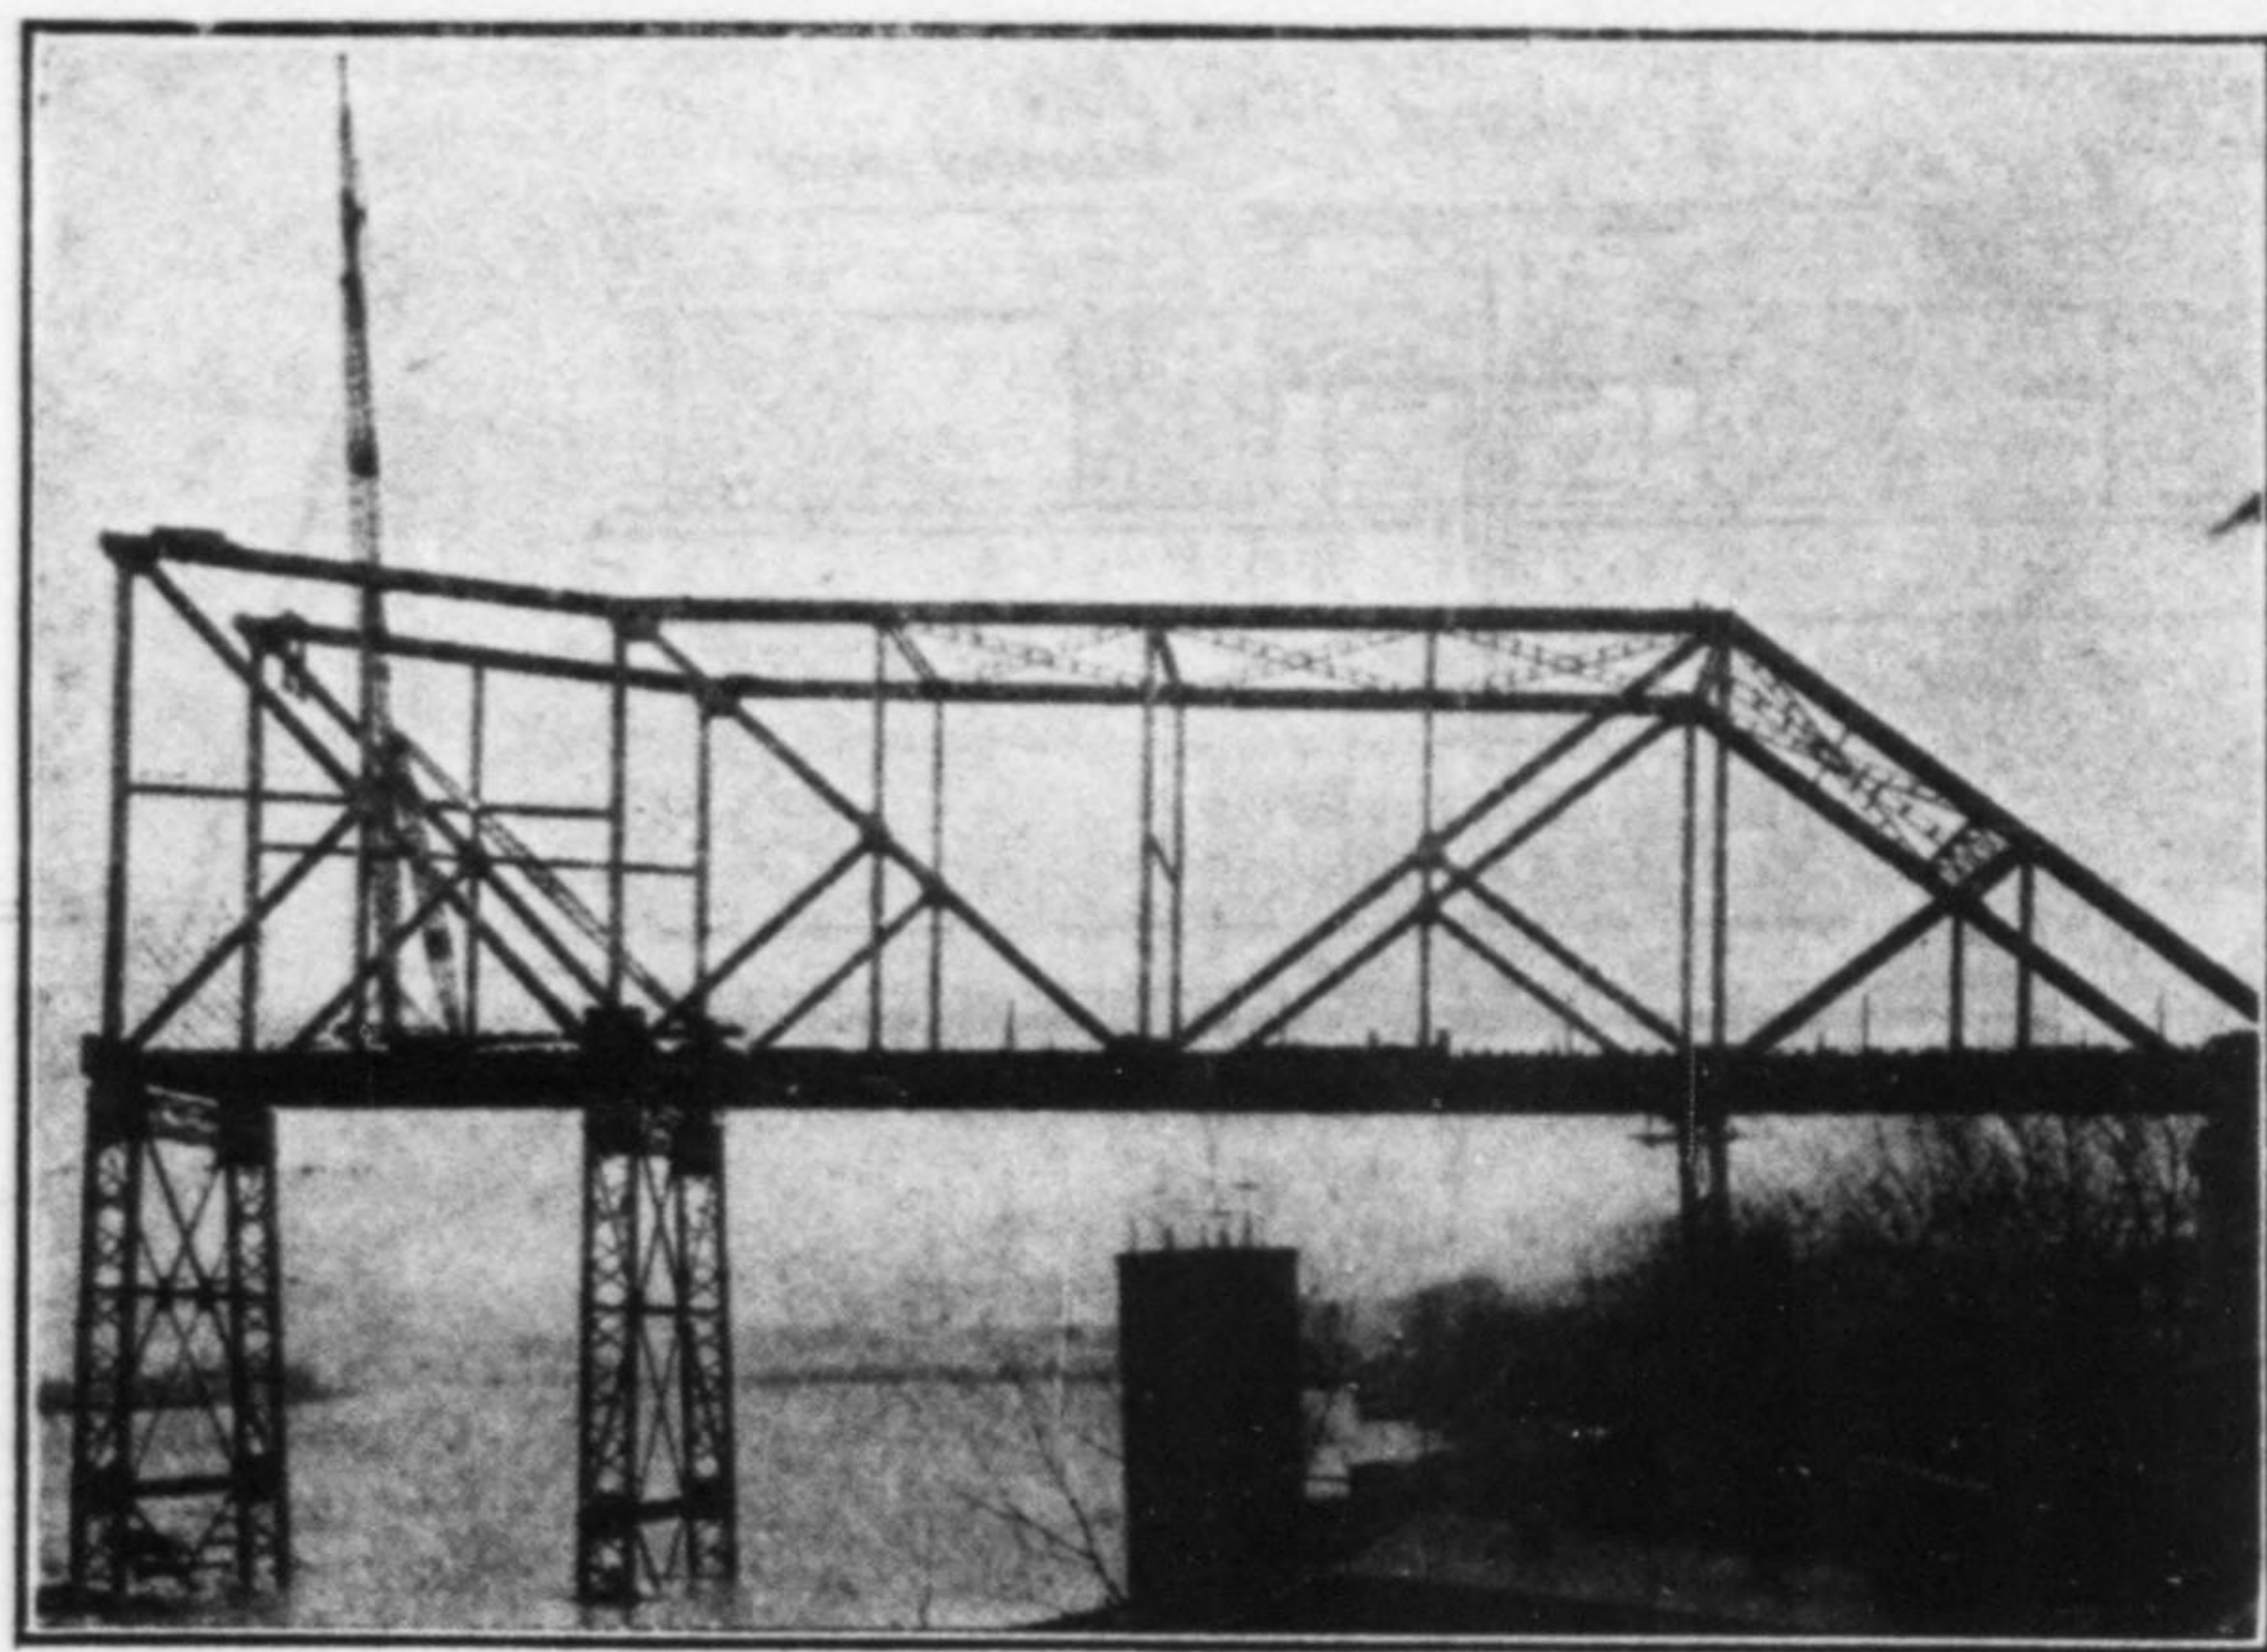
ERECTING ANCHOR ARM ON STEEL FALSEWORK
